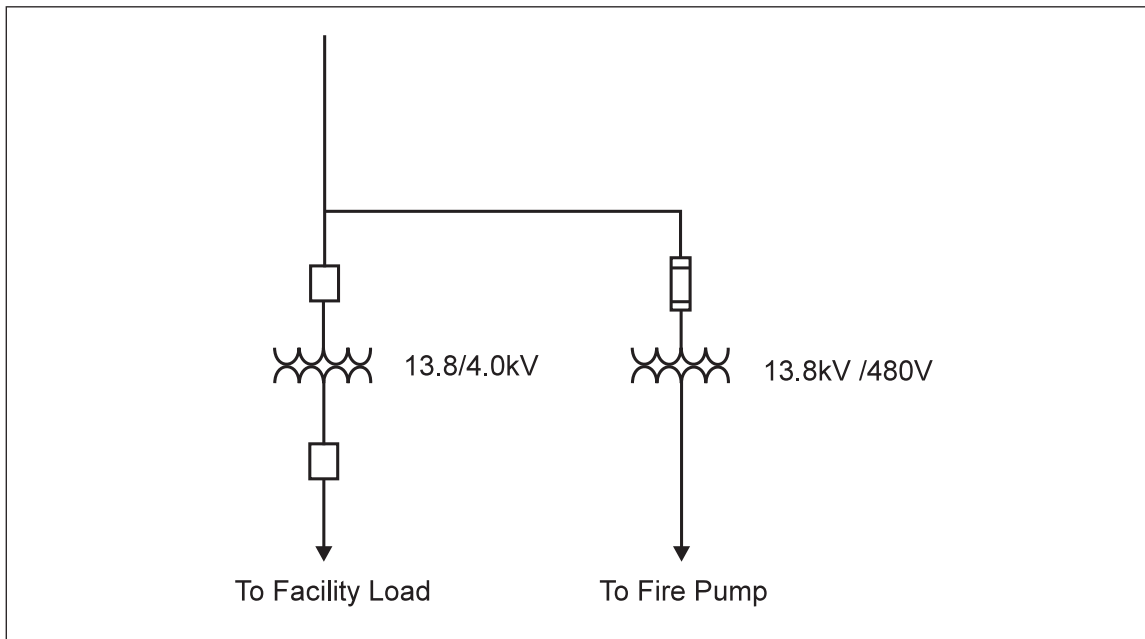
Typical Dedicated Fire Pump Motor Electrical Feeder
